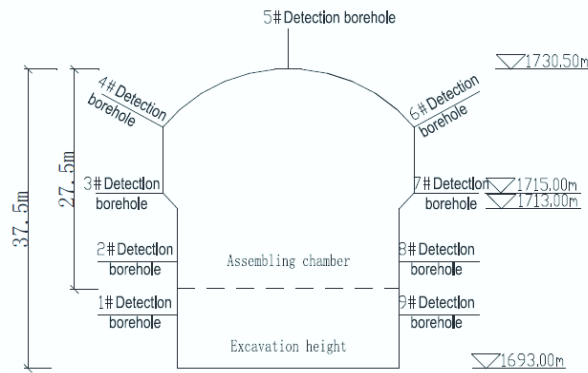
0+40 m Excavation profile for the powerhouse and layout of the monitoring boreholes
